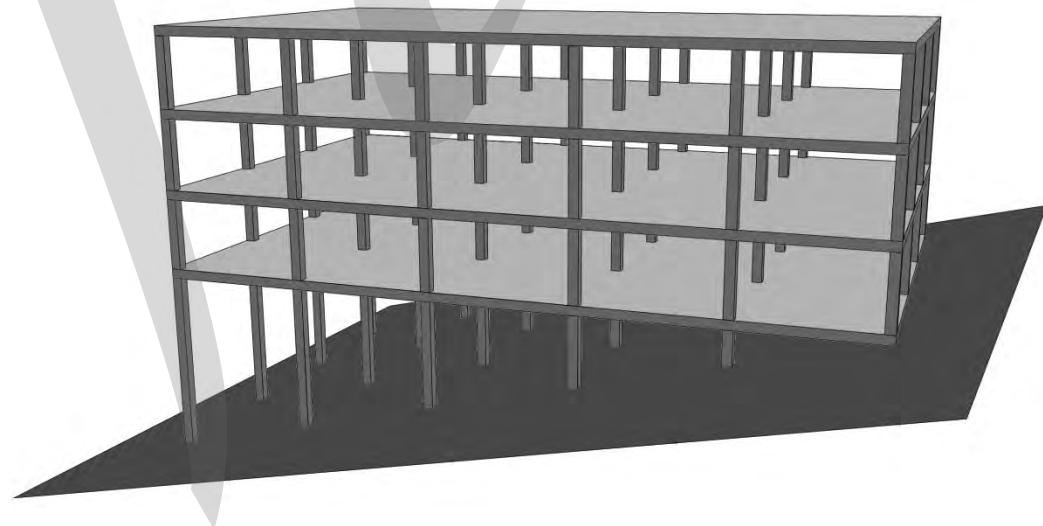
Buildings with different levels of foundation (should be avoided) [37]
